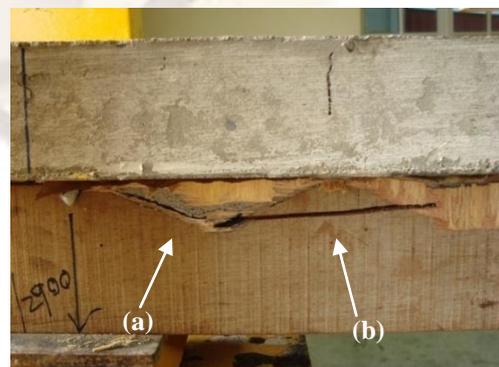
(a) Detachment of grout from notch; and (b) tensile crack at the connection far end of the slab
